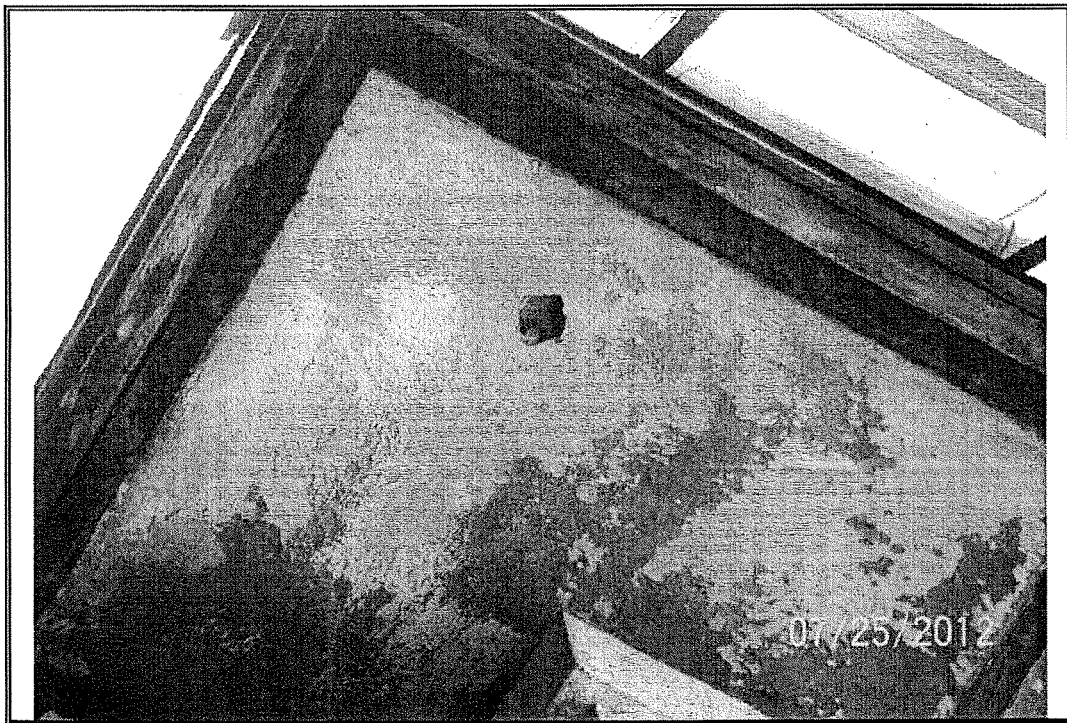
View of exterior roof decking on C Bld. (20%CH)
